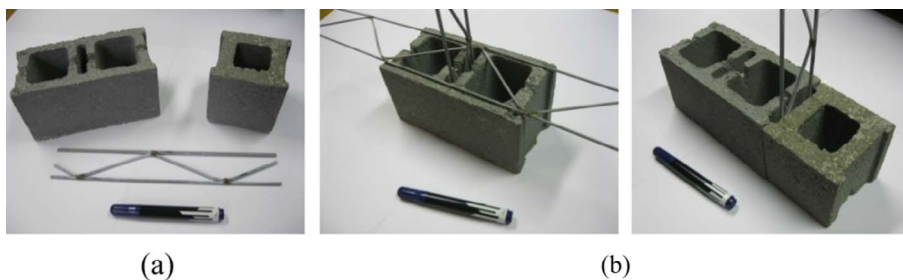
Details of the constructive system: (a) unit block, half unit block and steel truss type reinforcement, (b) traditional masonry bond and alternative continuous vertical reinforced joints.
